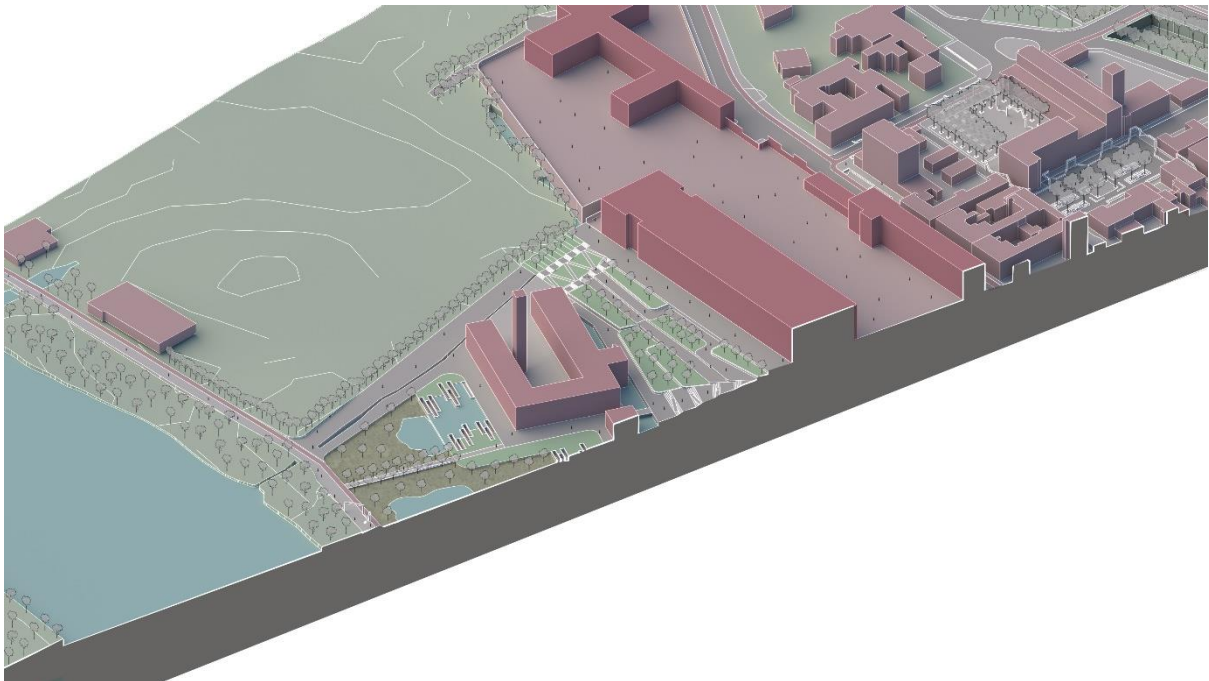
Sectional View through the Spinning Mill w.r.t. the Wetland
